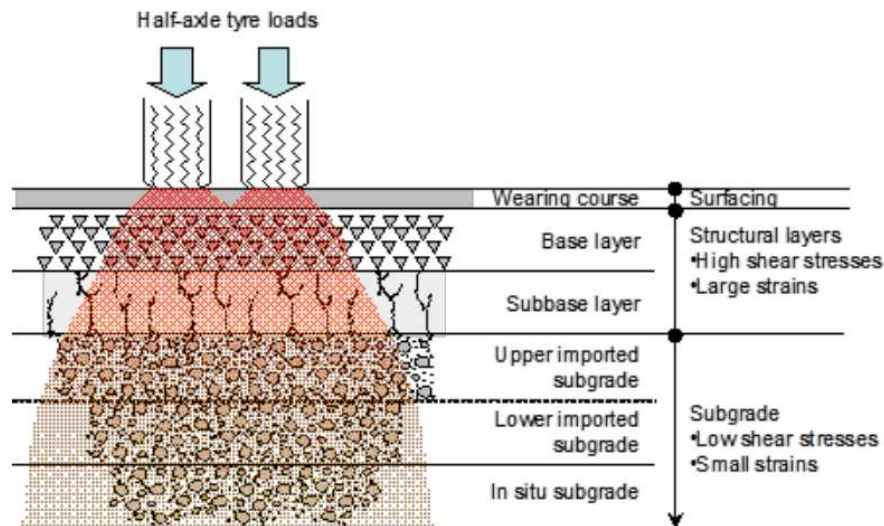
Stress Distribution in a Typical South African Flexible Pavement
